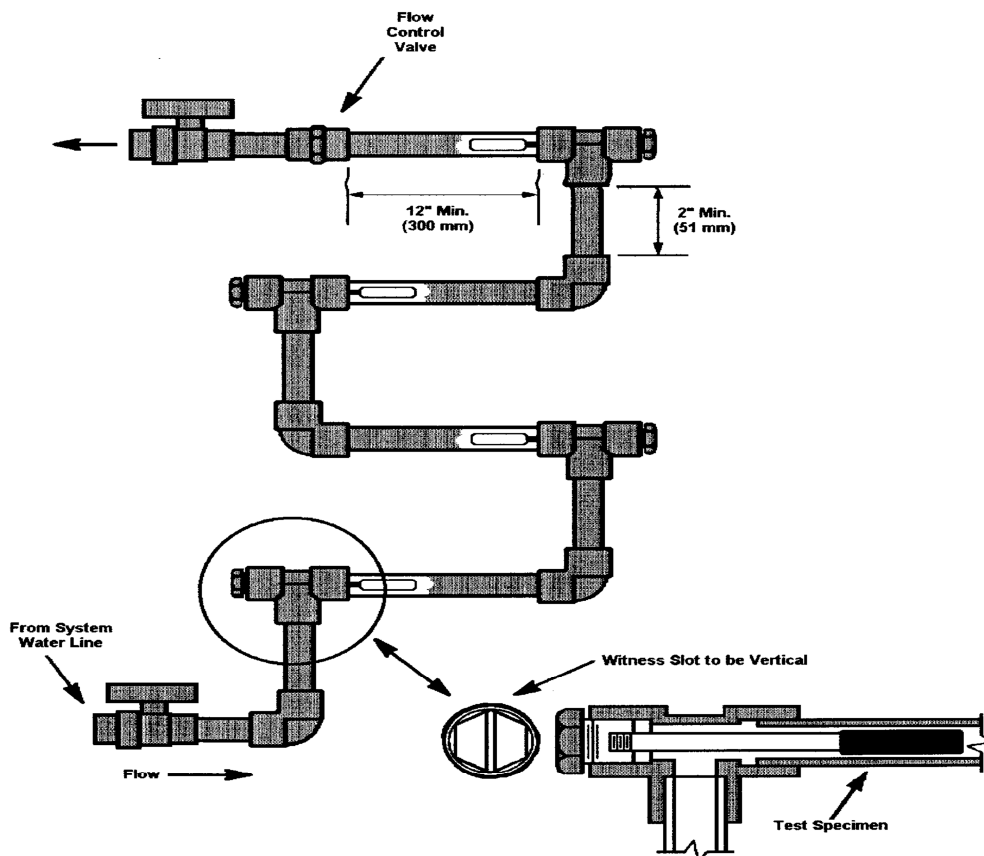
Installation of Corrosion Coupons (Source: ASTM D 2688-05)
